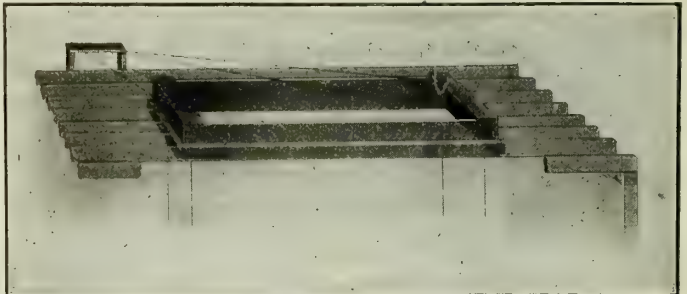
INSTALLATION OF BED IN CEILING WHERE THERE IS AN ATTIC ABOVE BED
